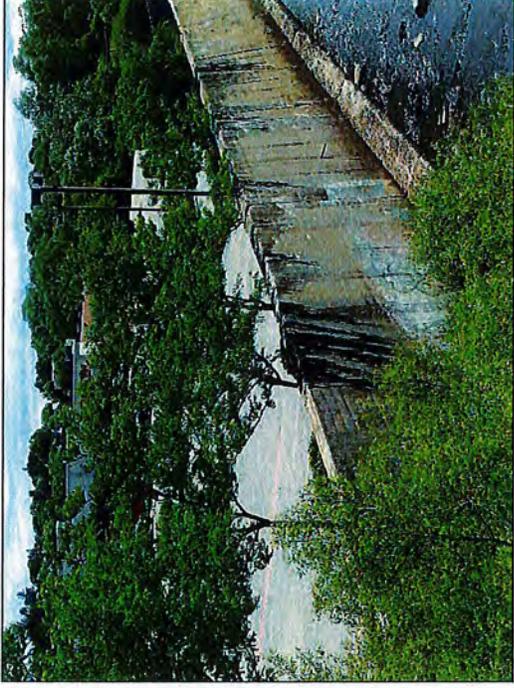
Water Street: View of floodwall cracks, trees on upper and lower flat spaces, and shoaling along the downstream right bank.
